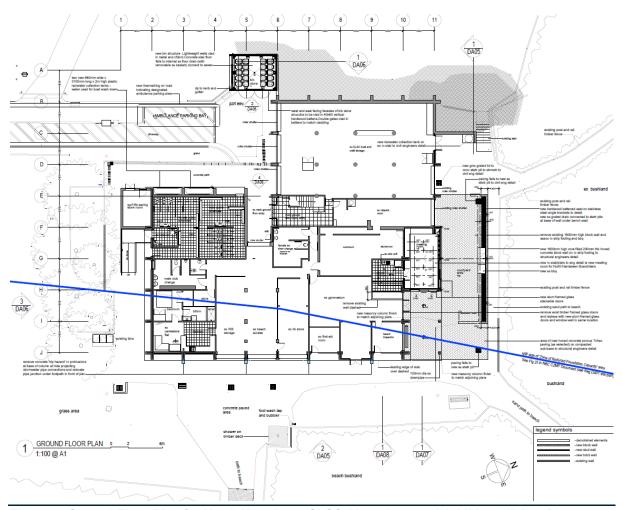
Ground Floor Plan for North Narrabeen SLSC Alterations and Additions (DA02-D)
